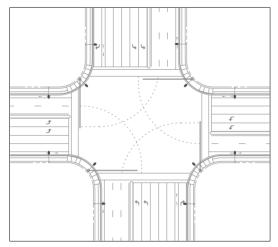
Typical Lighting Layout for Large Intersection
